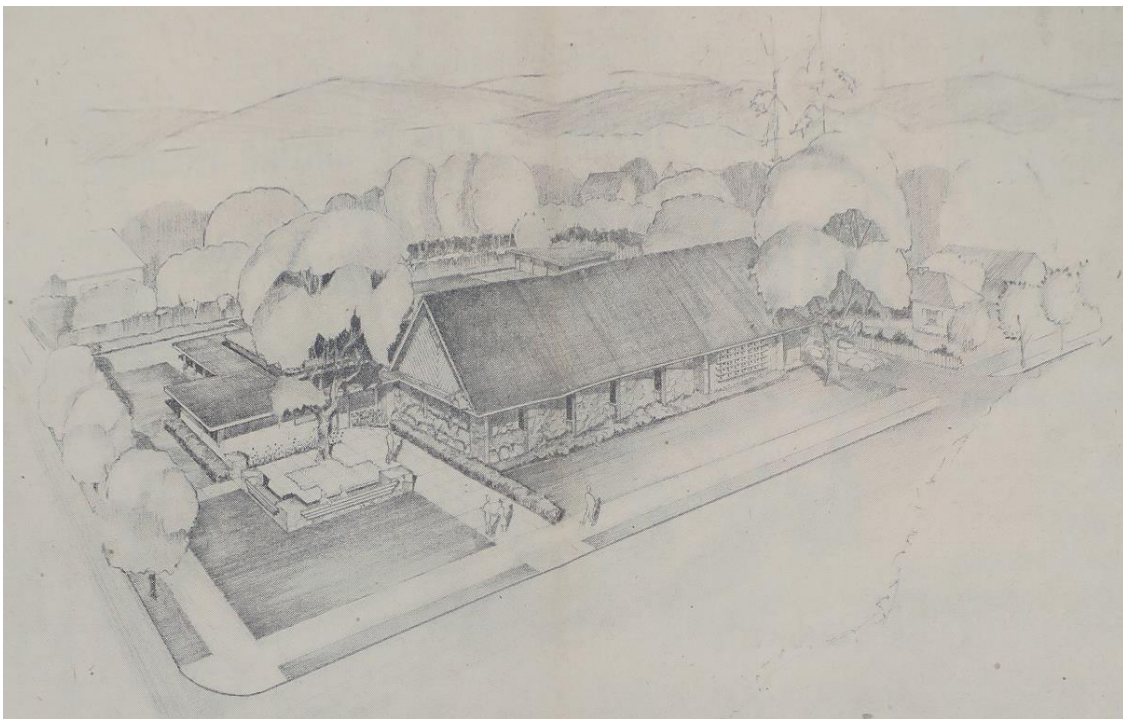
Drawing of subject building upon its grand opening, view from Middlefield Road and Addison Avenue.
